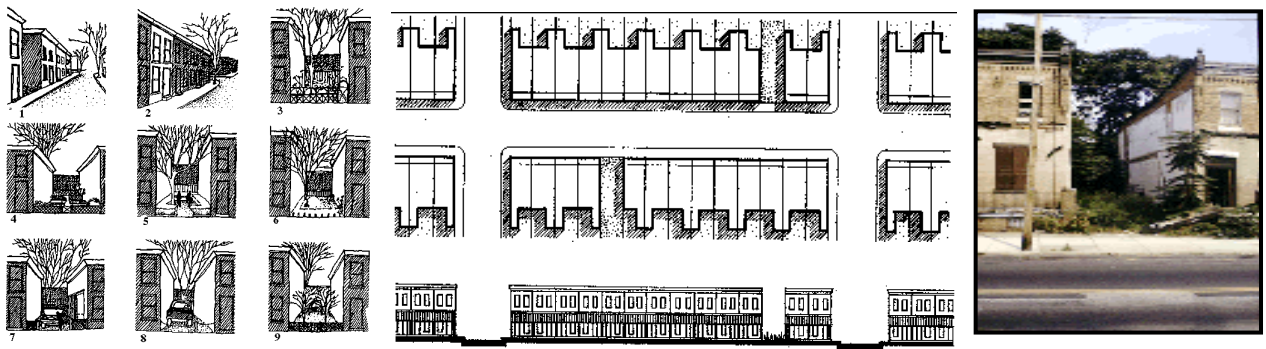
Picture and Plan showing Missing Tooth Vacant Land
